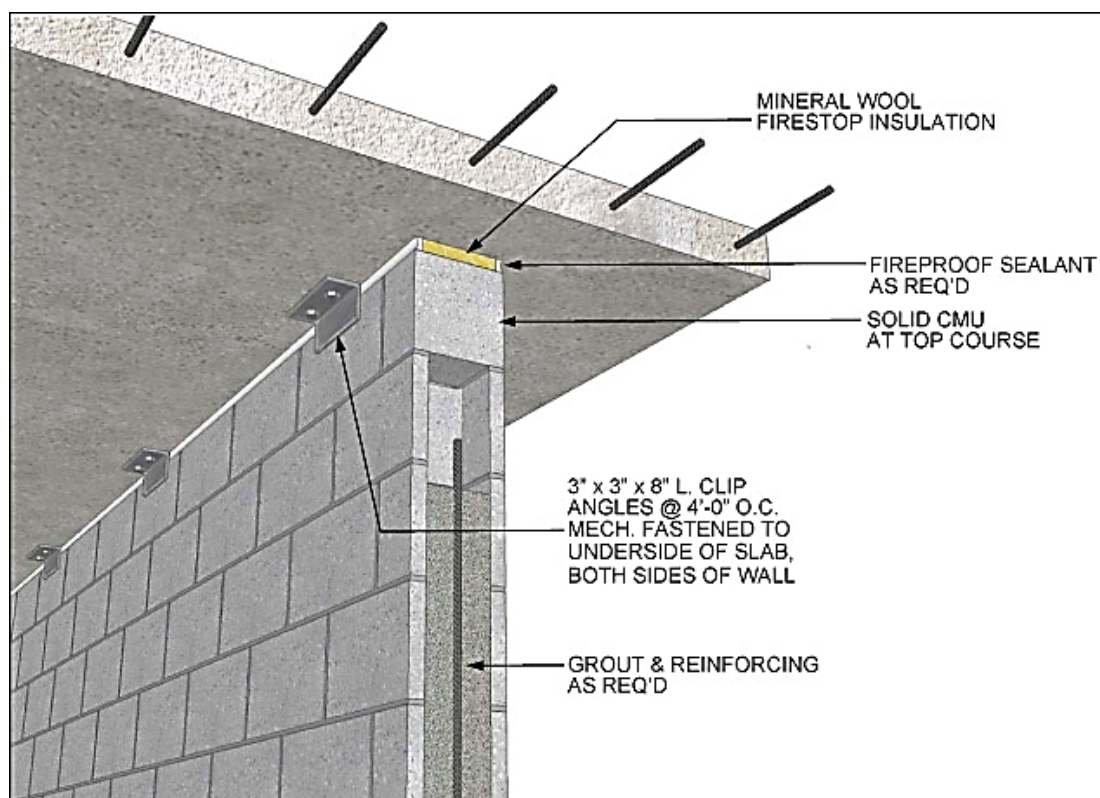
Components of concrete masonry firewall (Source: Imniwed, n.d.)
